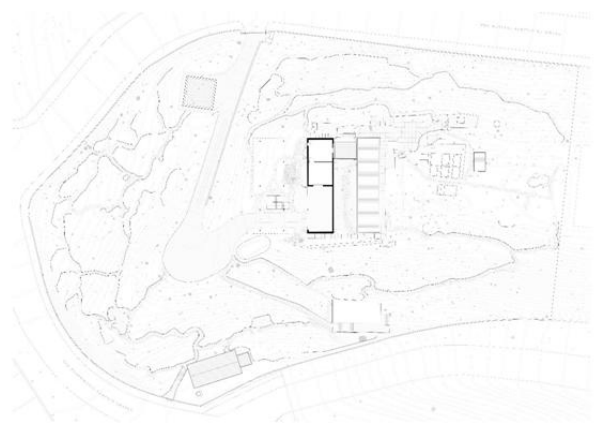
Plan of the site of *Casa de Vidro*. Author's elaboration, 2018.
